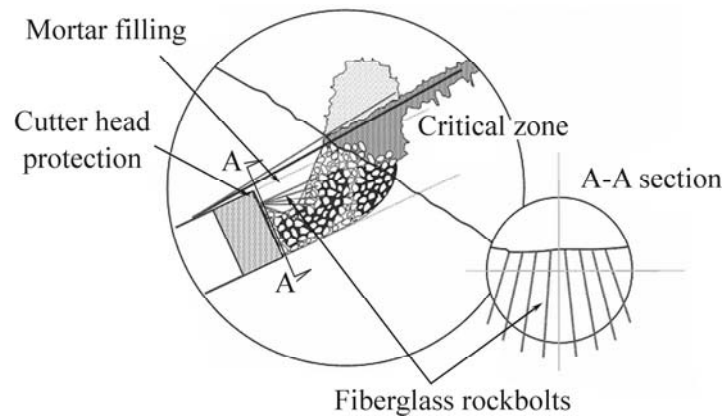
Ground reinforcements carried out in Maen tunnel (Italy) [52]
